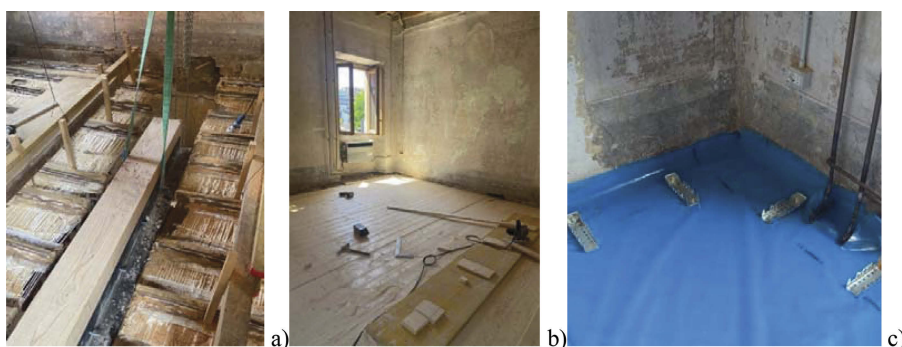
Room 33 seismic improvement actions (a) main beam replacement; (b) cross deck placement; (c) floor-wall connections with inclined drills.
